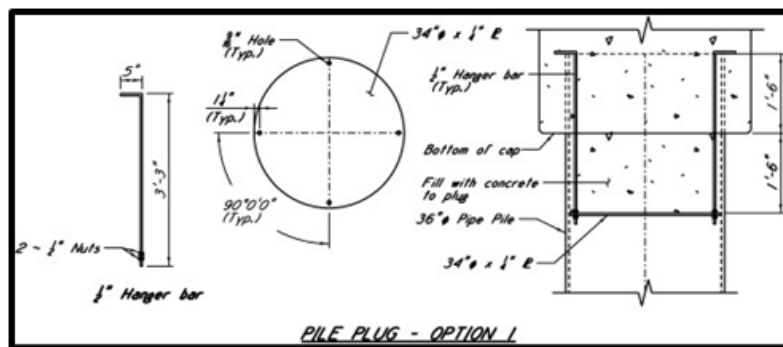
MDOT-Concrete plug detail, Wolf River
